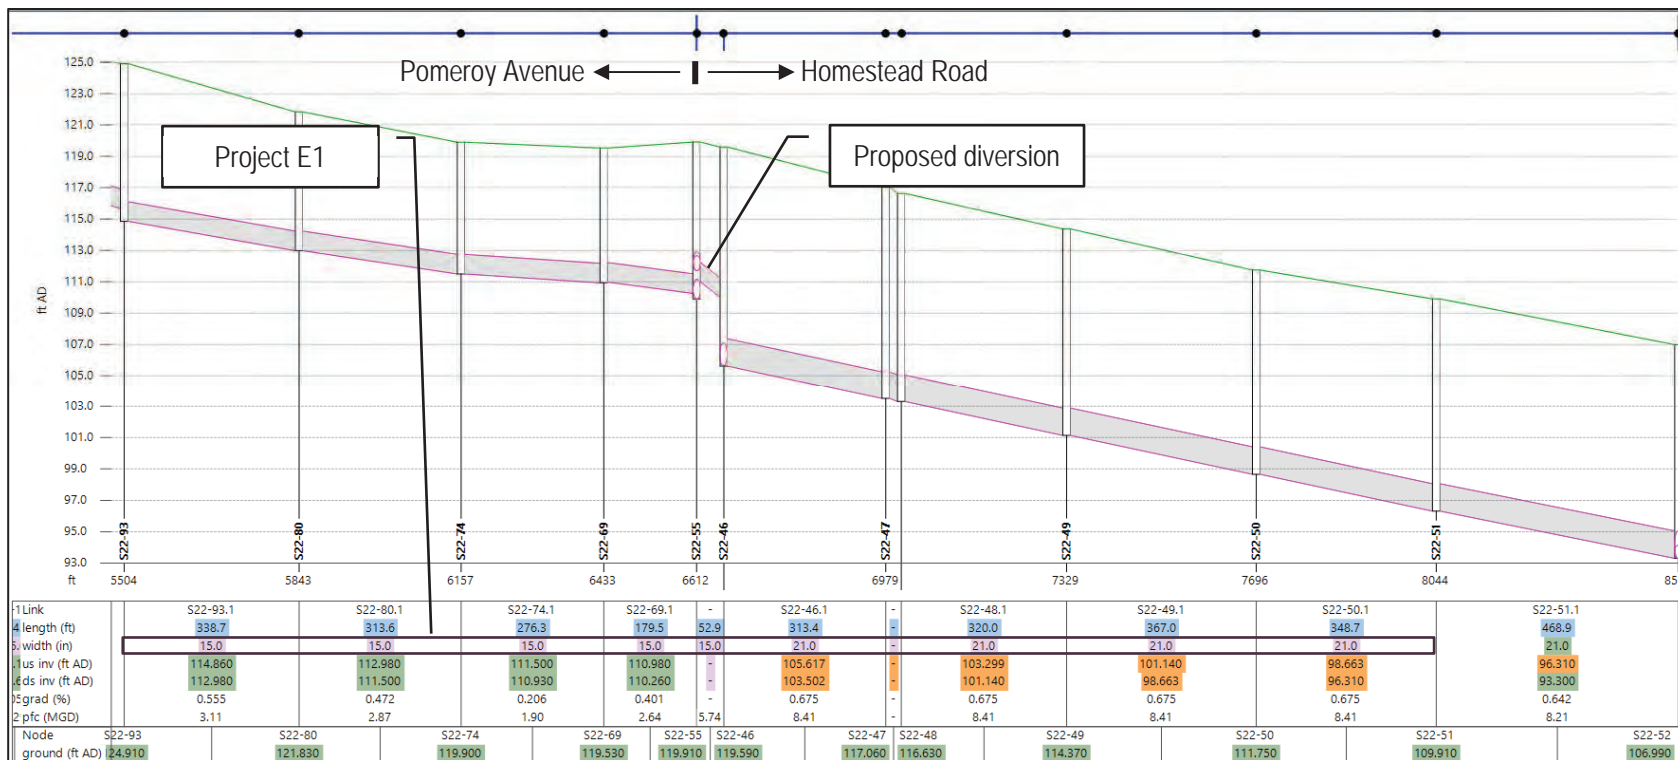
Proposed Improvement Projects along GAP and Lafayette Street Trunks
